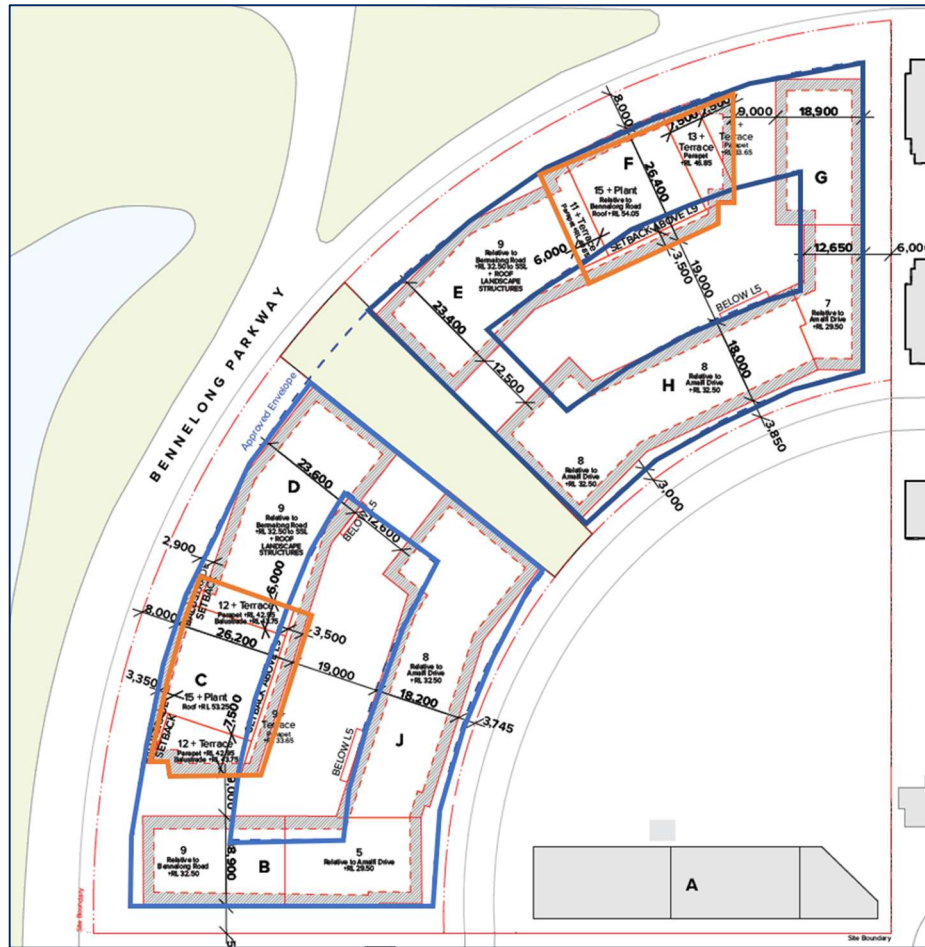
| Building depth and separation from proposed envelopes Buildings C and F (orange) and as built buildings (red) with concept plan envelopes (blue) (Source: FRTS Urban Design Report Appendix 1)
